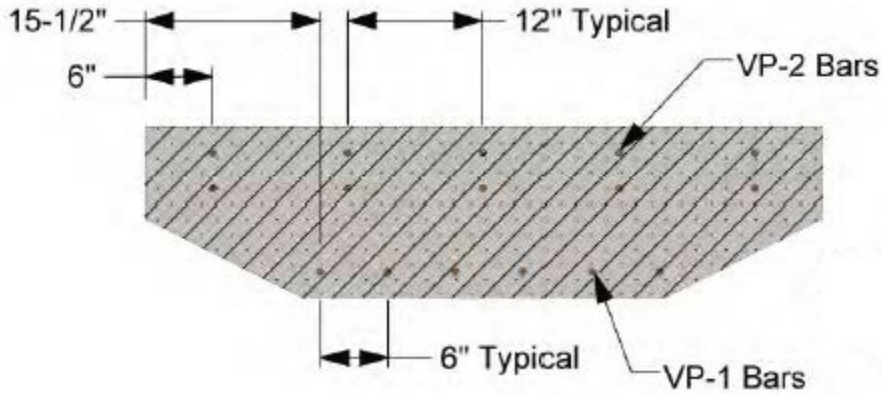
TL-5 TxDOT T224 Post Cross-Section [13]
